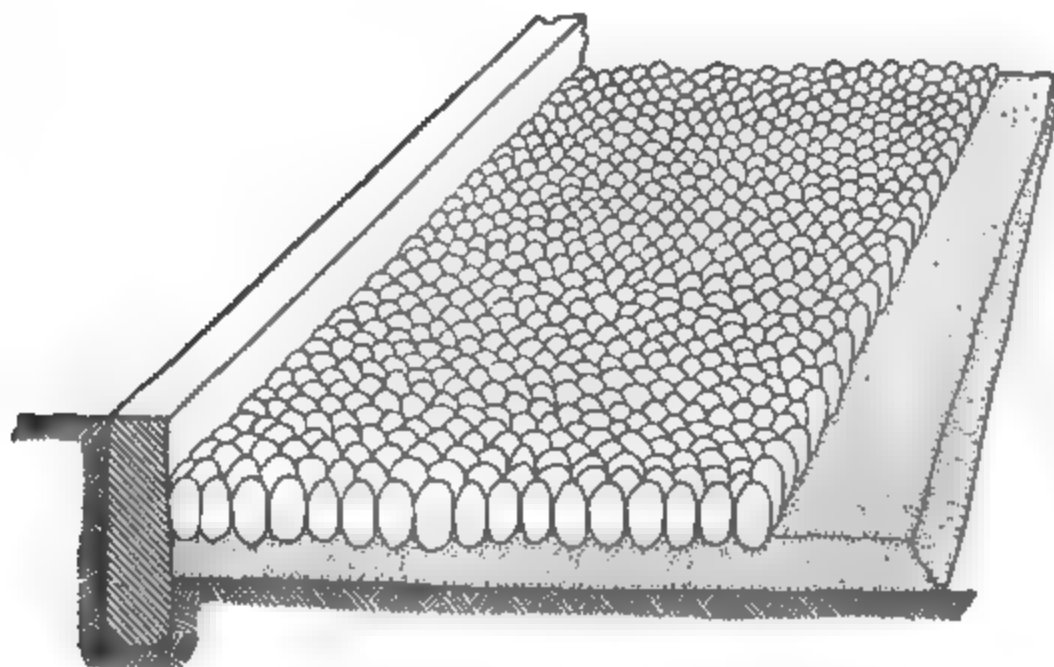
SECTION OF COBBLE-STONE PAVEMENT.
